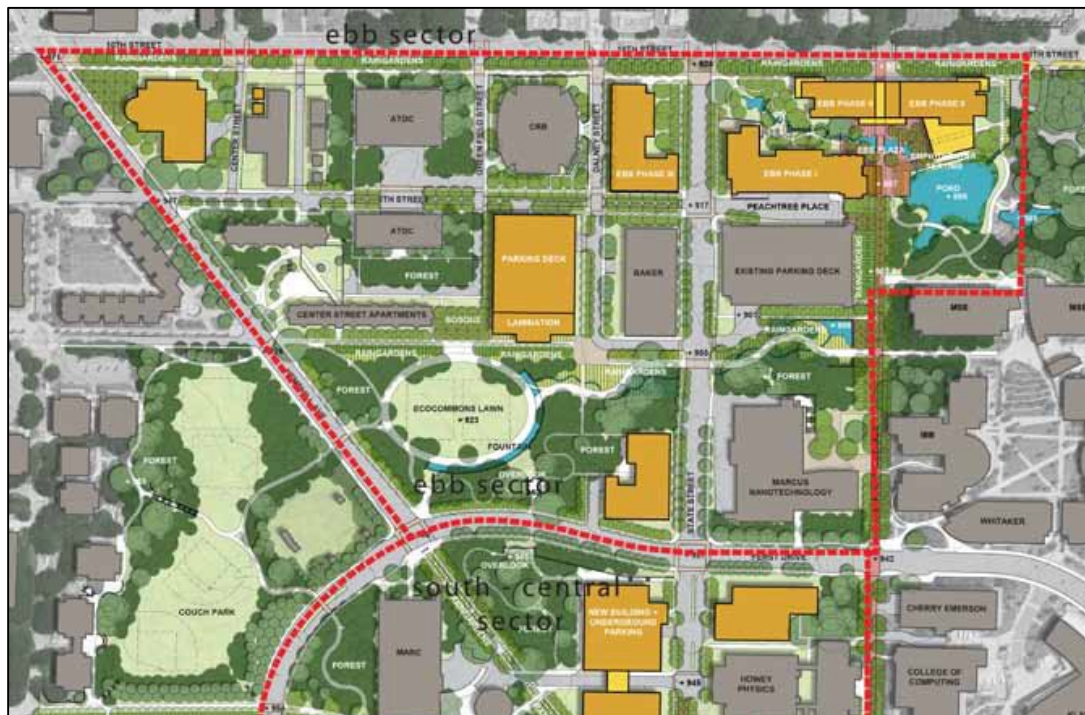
The existing EBB sector plan links greenspace throughout the North and West campus corridors
